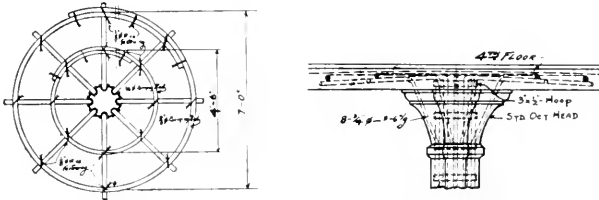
Mushroom Column Reinforcement in Curtis Building. Panels approximately 16 ft.
